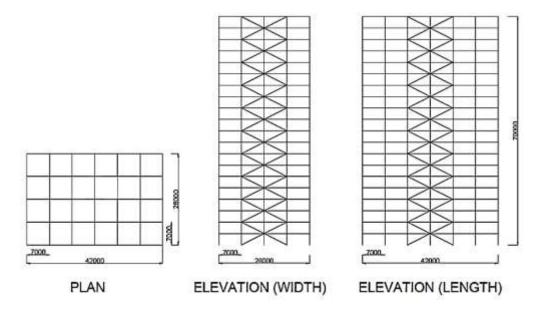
Structure Dimensions (Plan, Elevation along Width and Length)
